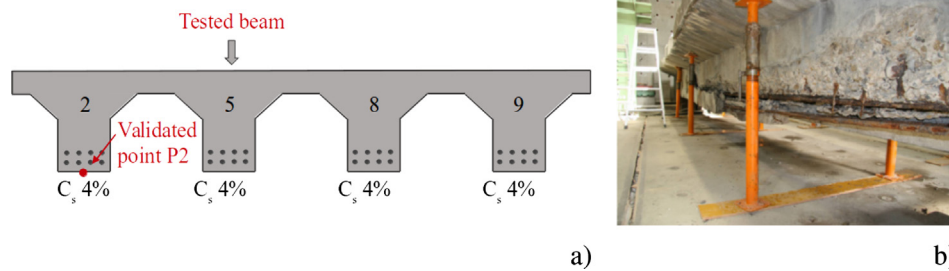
Cross section of Nougawa bridge (a). Cut-out, validated beam (b) [34].
